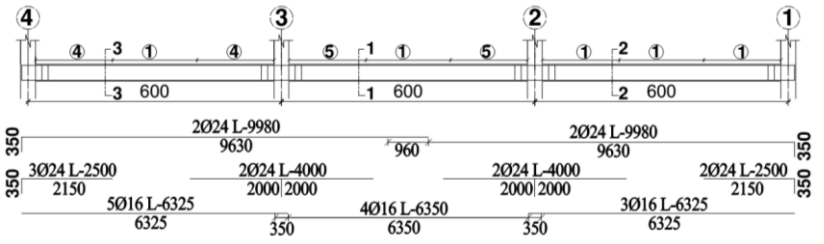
Sample slab detailing for G+2 building with C-25 concrete
